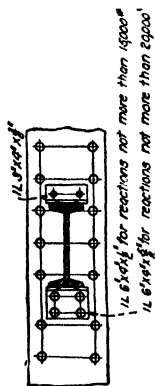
Standard connections beams to columns for 12, 10, 9, 8, 7 and 6-in. I-beams with reactions not more than 20,000 lb.
